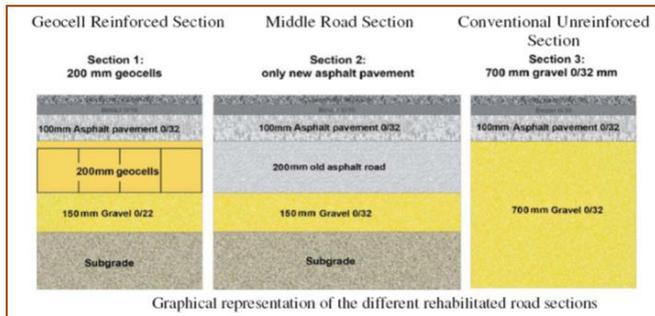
Cross-sections of the Neoweb reinforced and Original unreinforced sections in Road ?
